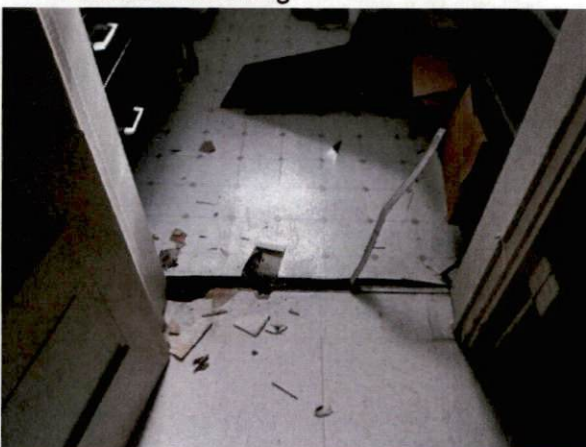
View of HA 22, non-asbestos containing white with 4" grid and brown diamond vinyl sheet flooring.
